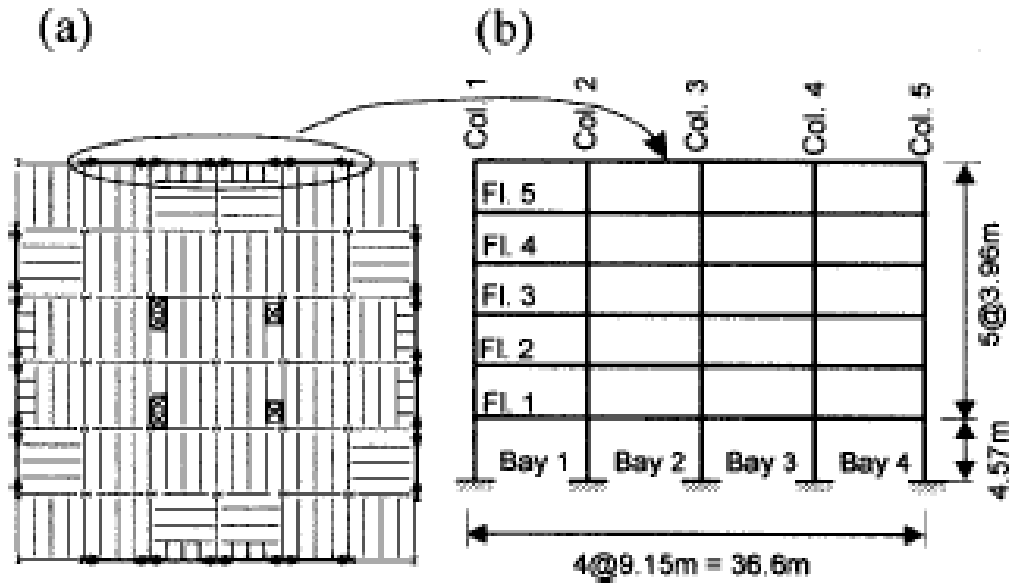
(a) Plan of prototype building; (b) Elevation of prototype frame
